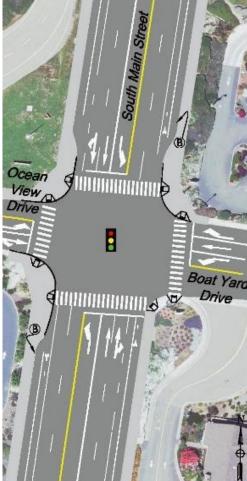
Main Street (State Highway 1) Corridor Pedestrian Enhancement – Noyo River Bridge to Highway 20 (Source: South Main Street Access and Beautification Plan, 2011)
